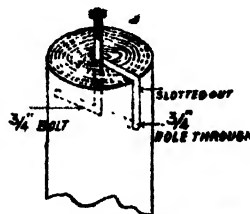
Foundation stump, showing how anchor bolt is placed.
